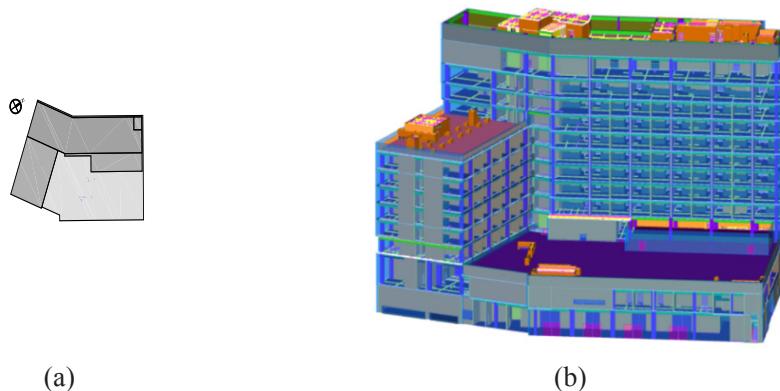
Hotel layout plan:(a) plan view, and (b) three-dimensional view.
